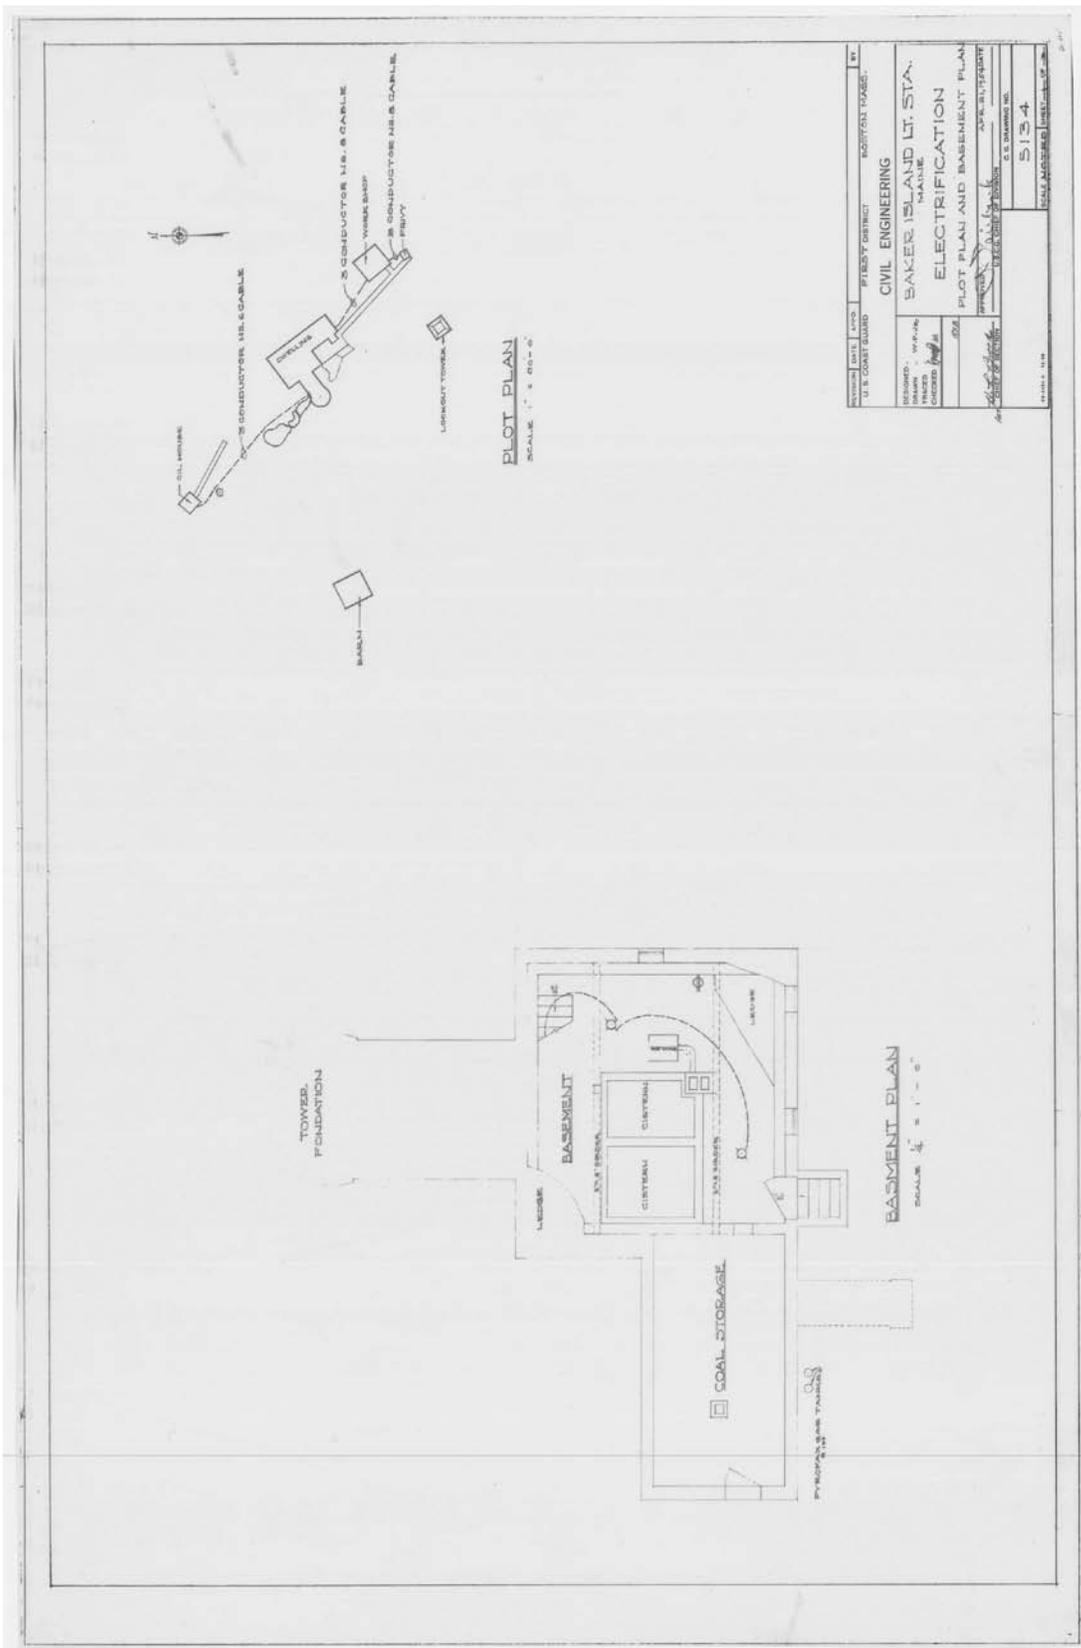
Sheet 1: "Baker Island Lt. Sta., Maine, Electrification: Plot Plan and Basement Plan," April 21, 1954.
